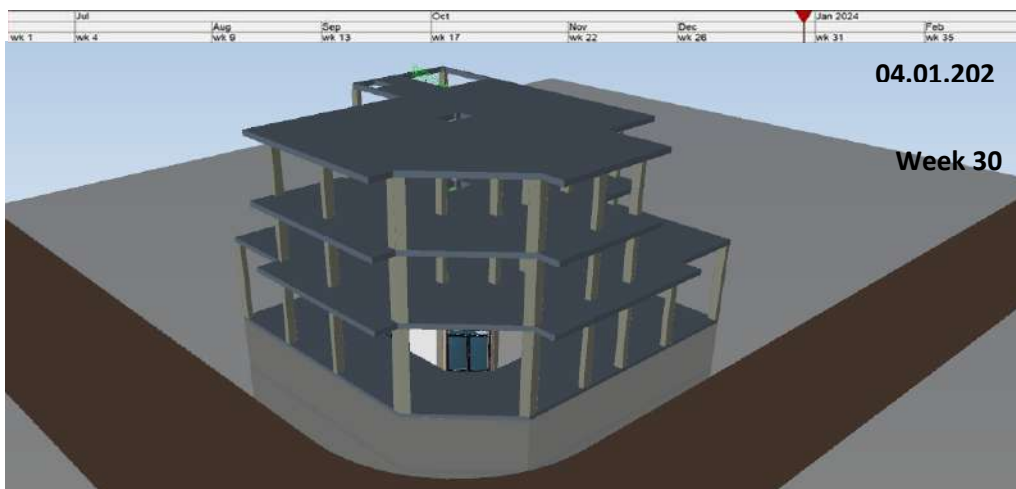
structural work for the 2nd floor and architectural work for the ground floor Completed
